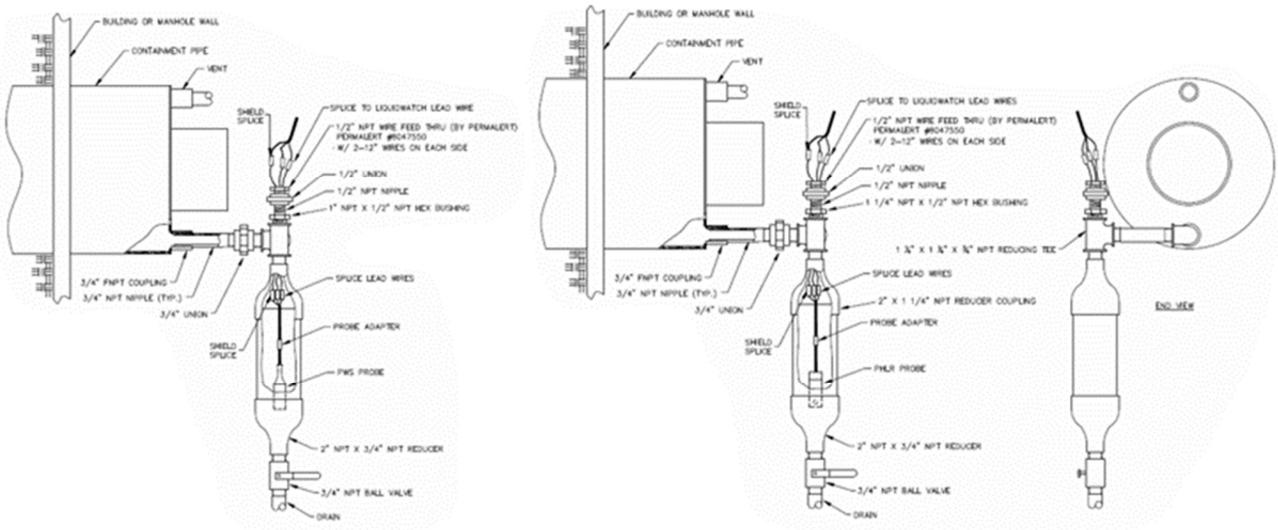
Typical PWS-LW, and PHLR-P-LW Probe Installations at End Seal
